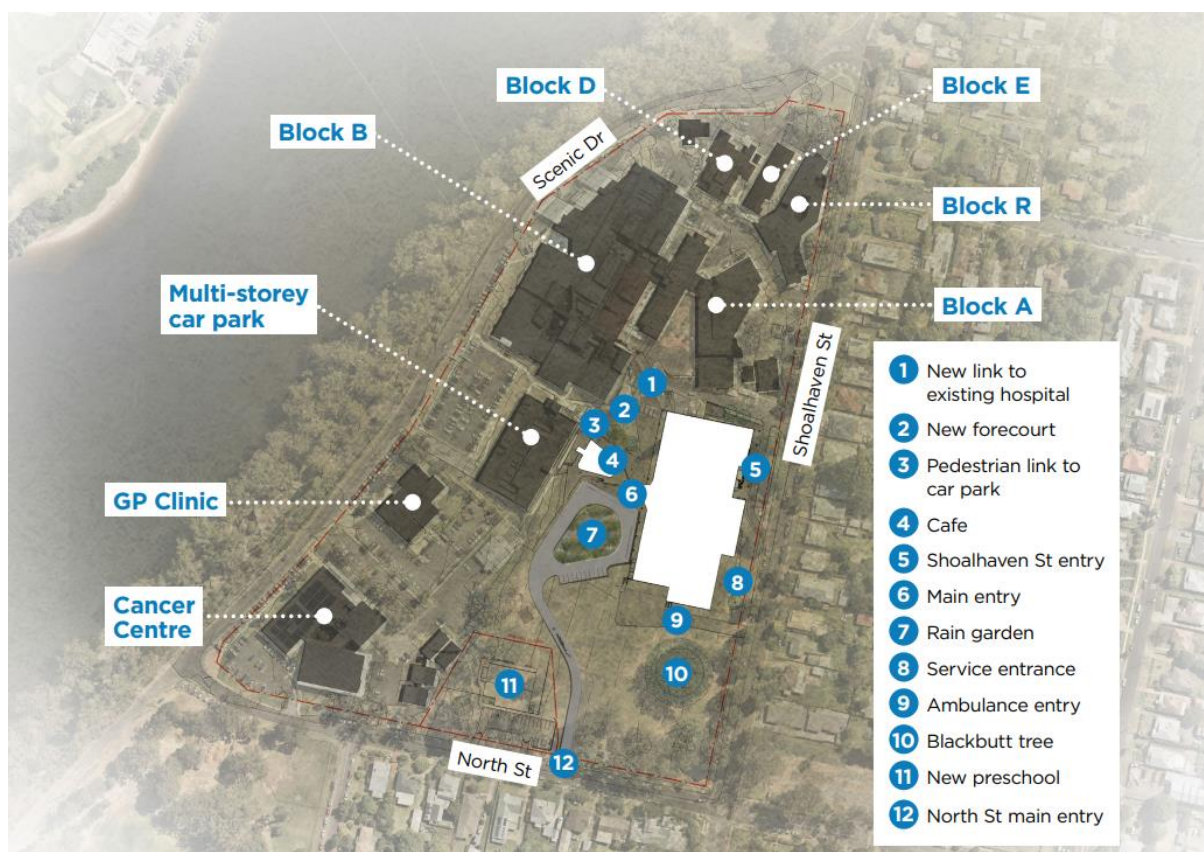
Existing Site Plan with proposed development footprint (Conrad Gargett)
